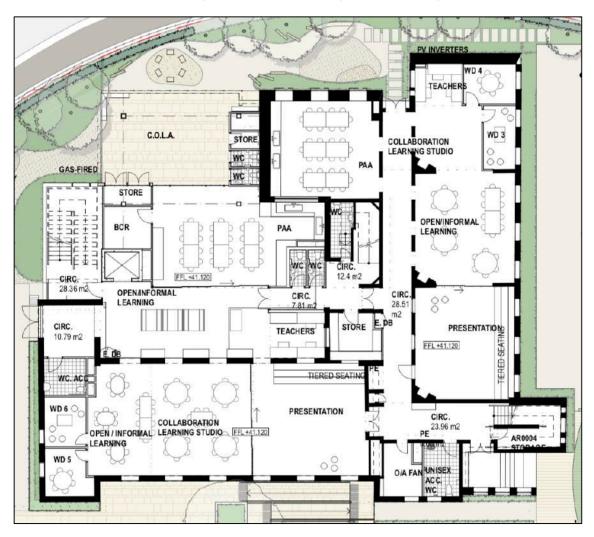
Proposed ground floor plan, existing school building and additions. Note the original 'L-shaped plan' of the 1940s structure and internal rooms are still clearly identifiable (FJMT DA-2002, 18.12.19)
